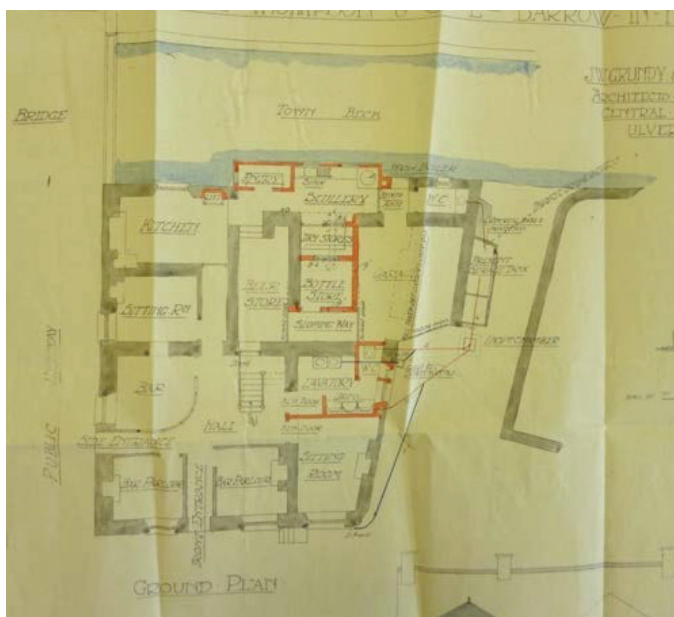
(left): Proposed ground floor plan (CAC(B) BSRDNL/3/189 1921)
